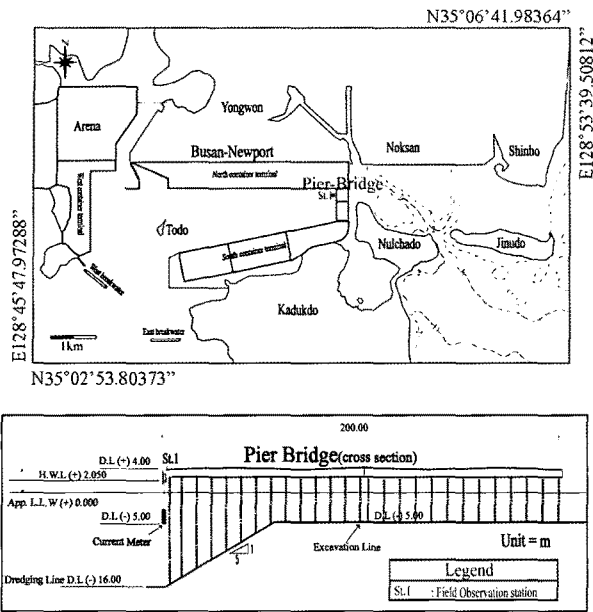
The station at the pier bridge in Busan New-port and the sampling location on a cross-section of the pier bridge.
